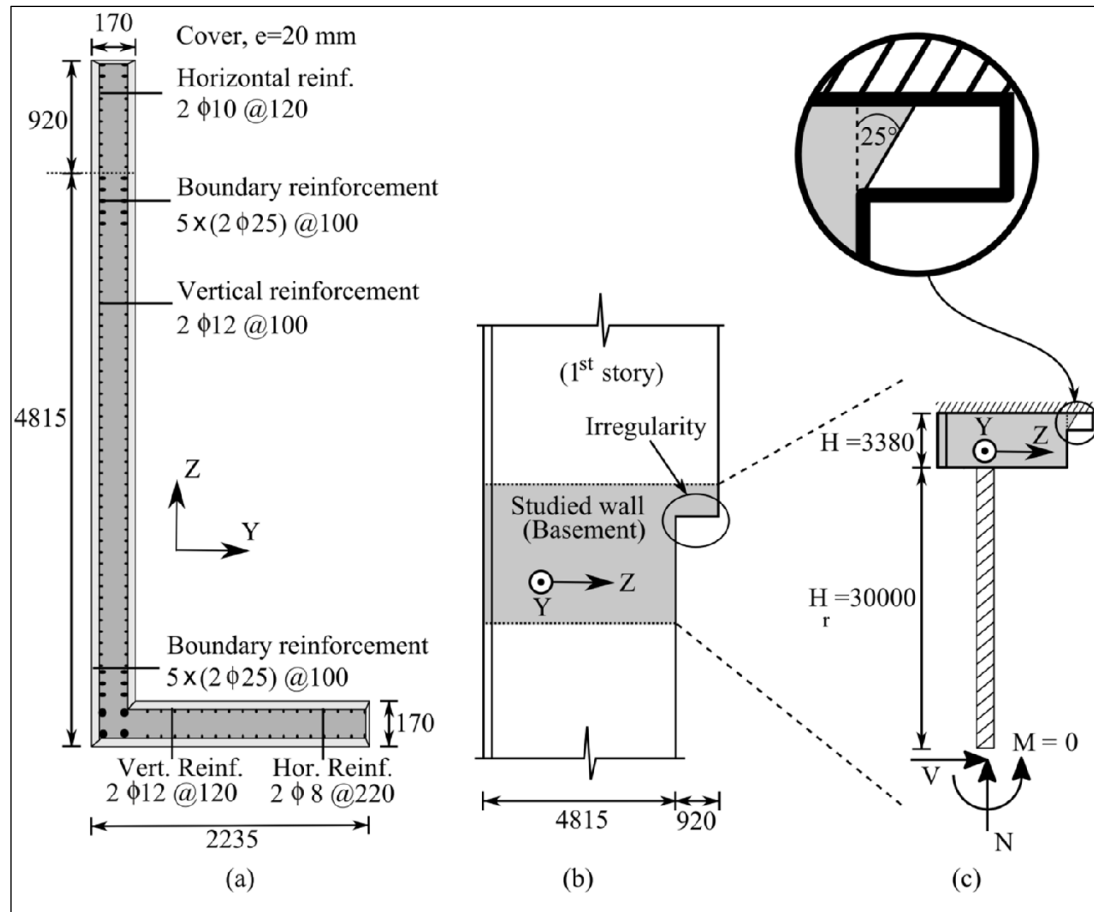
Description of wall WL: (a) detailing of the section, (b) schematic elevation inside building and (c) model of the studied zone.
